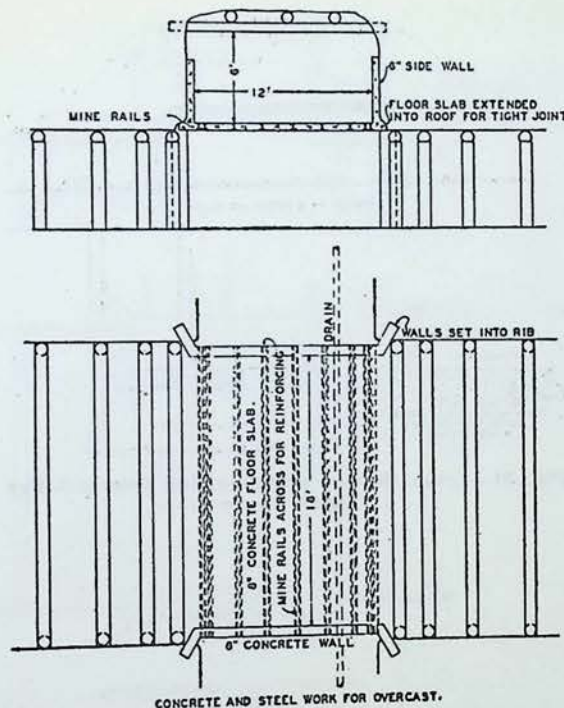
Concrete Slab, Reinforced By Rails Across Entry, For Use Under Light Cover.
